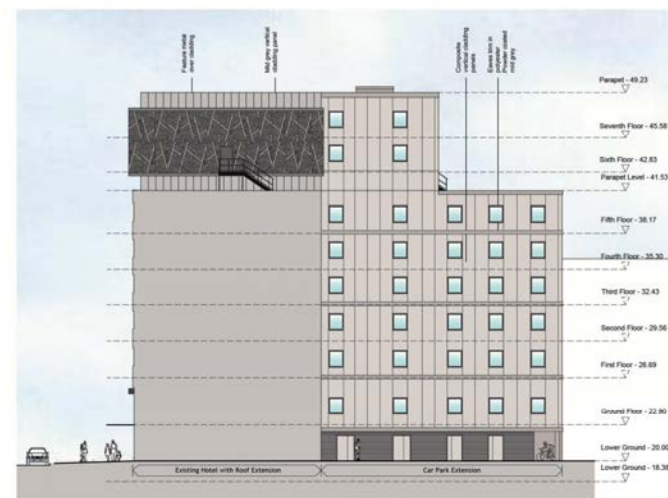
Artist's Sketch View of Proposed Euston Road Frontage
